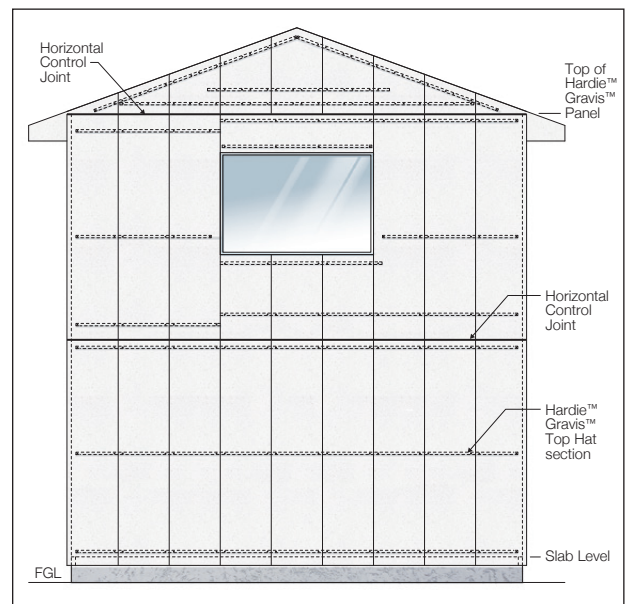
TWO STOREY LAYOUT - GABLE ROOF ELEVATION
